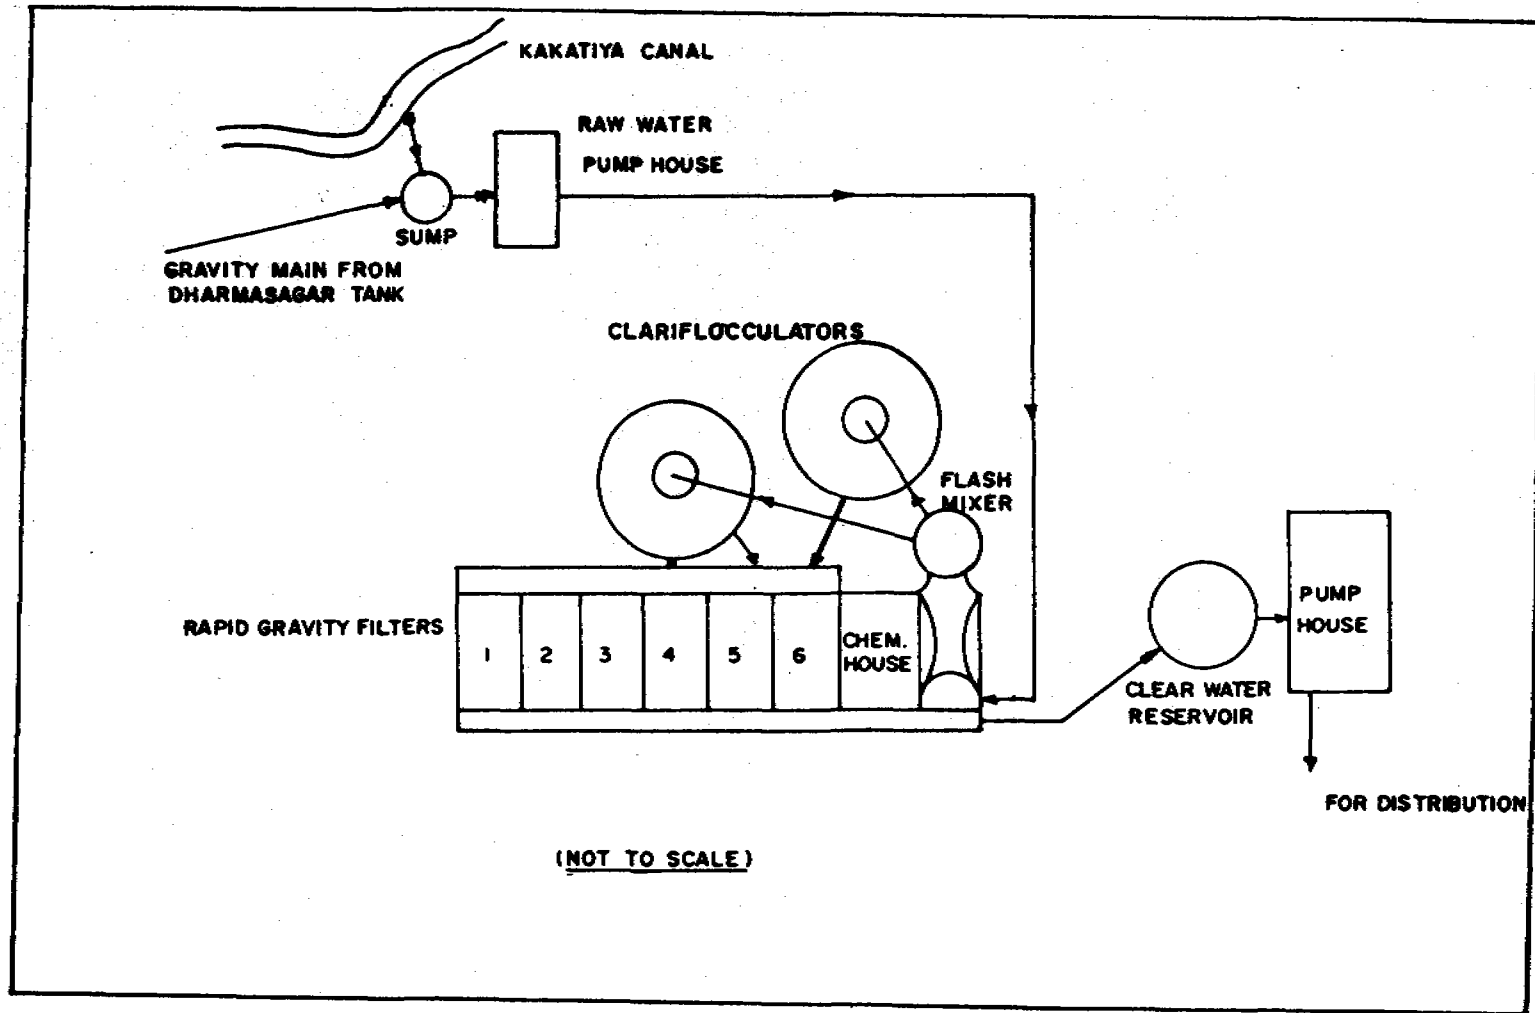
LAYOUT PLAN OF PRATAPRUDRA TREATMENT WORKS, WARANGAL
